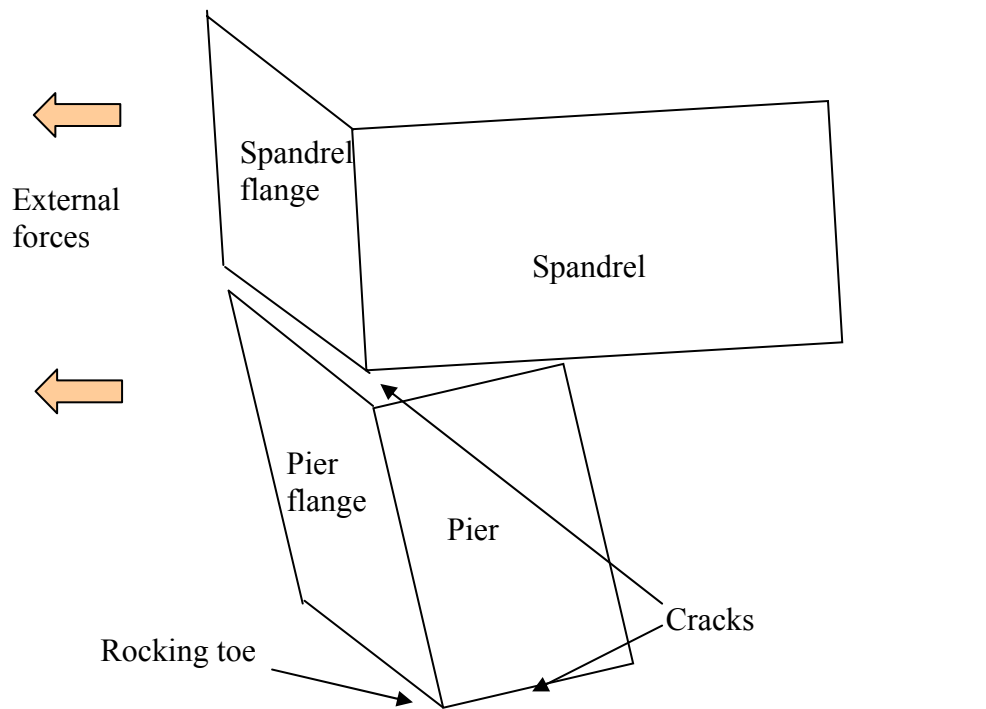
Pier flange and spandrel flange on the compressive side of a pier
